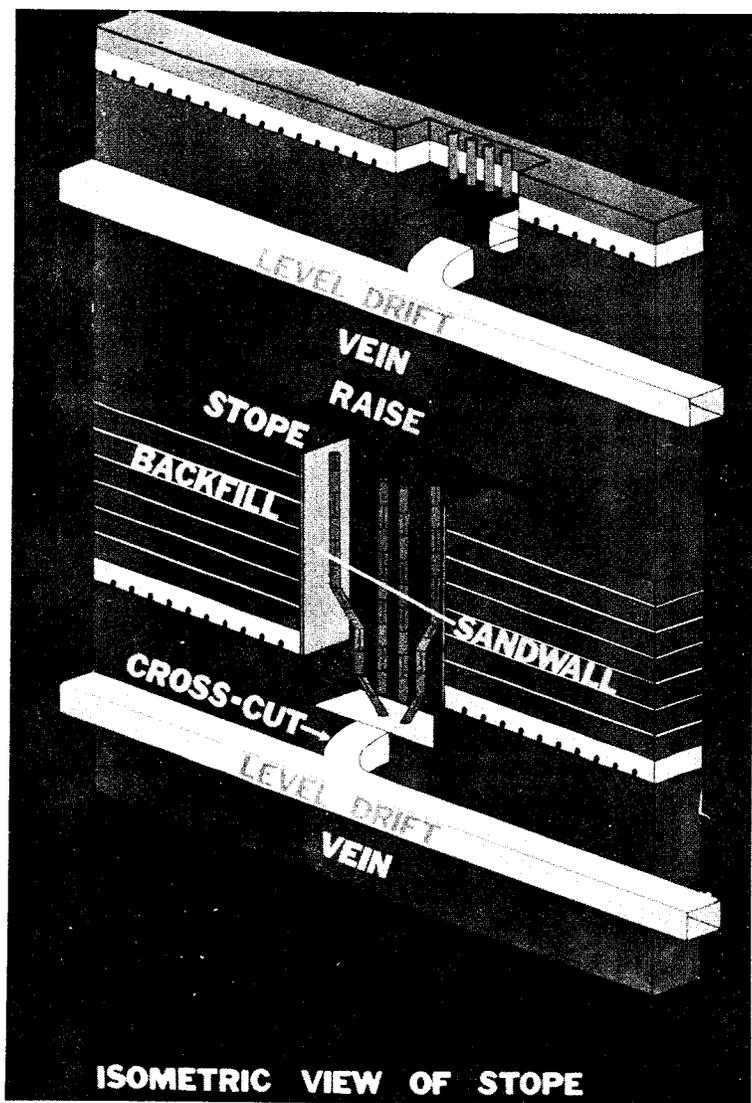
Cross-sectional view of cut-and-fill stope mine.
